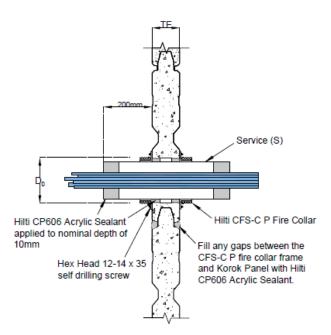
Flexible conduits < 50 mm in Dia. through minimum 51 mm Korok wall system
